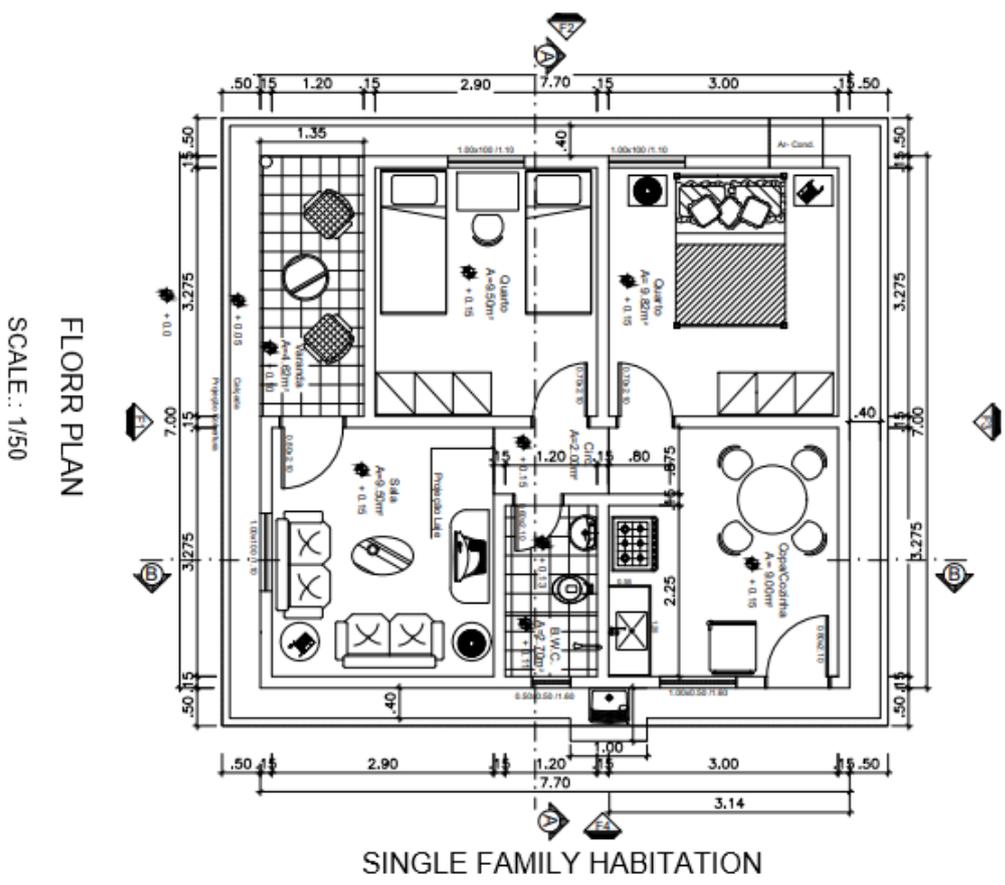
Family residence's Floor Plan – in which the solar heater implantation was done
